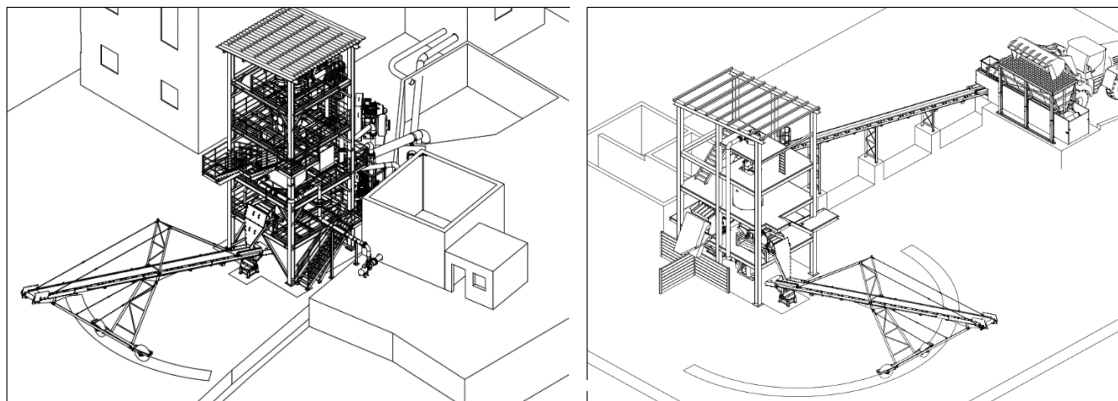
Left: General arrangement drawing fresh tailings, Right: General arrangement drawing stock tailings. (Both left & right sketches are excerpts from an engineering package by AKW Equipment + Process Design).
